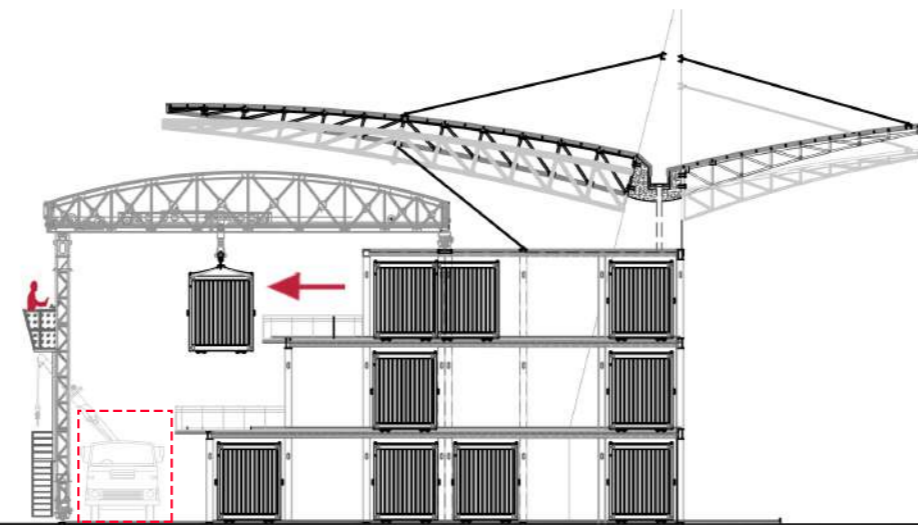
# DETAIL CONSTRUCTION : Hillman Roller and Gantry
